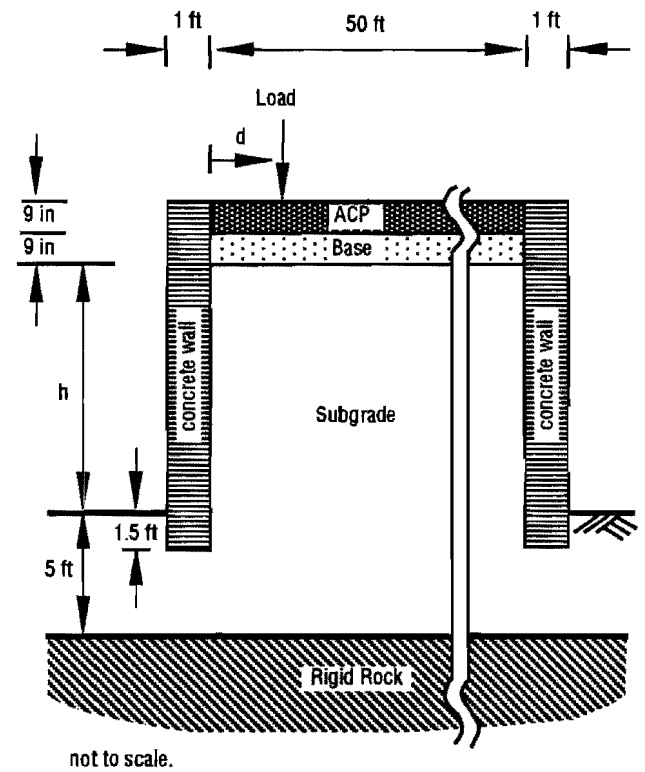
Idealized cross-section of the test site on Route 1, in Austin, Texas with the concrete retaining walls (Profile 4)
